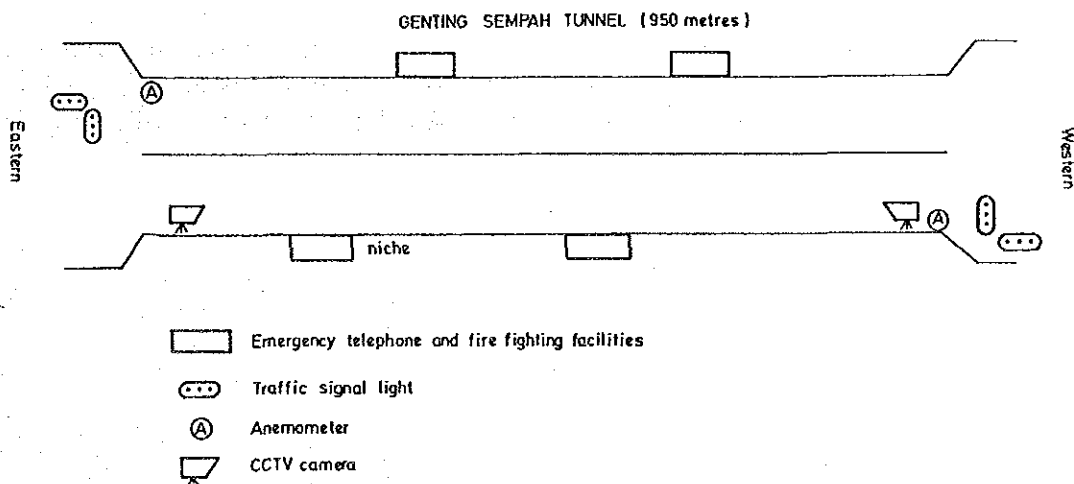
Layout of Main Equipment in Genting Sempah Tunnel
